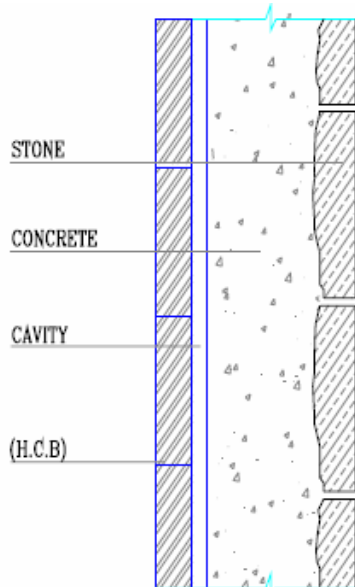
Exterior wall built from stone wall, concrete block wall with 5cm cavity in between.
